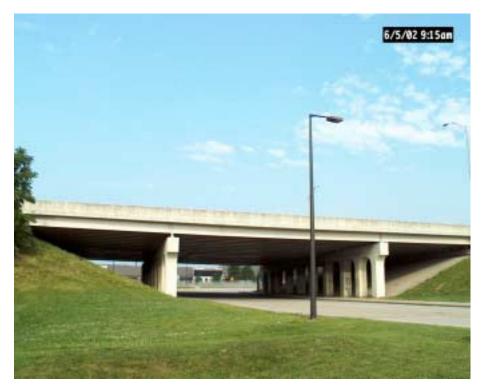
View of bridge at the east entrance to the Ky. Fair and Exposition Center after painting.
